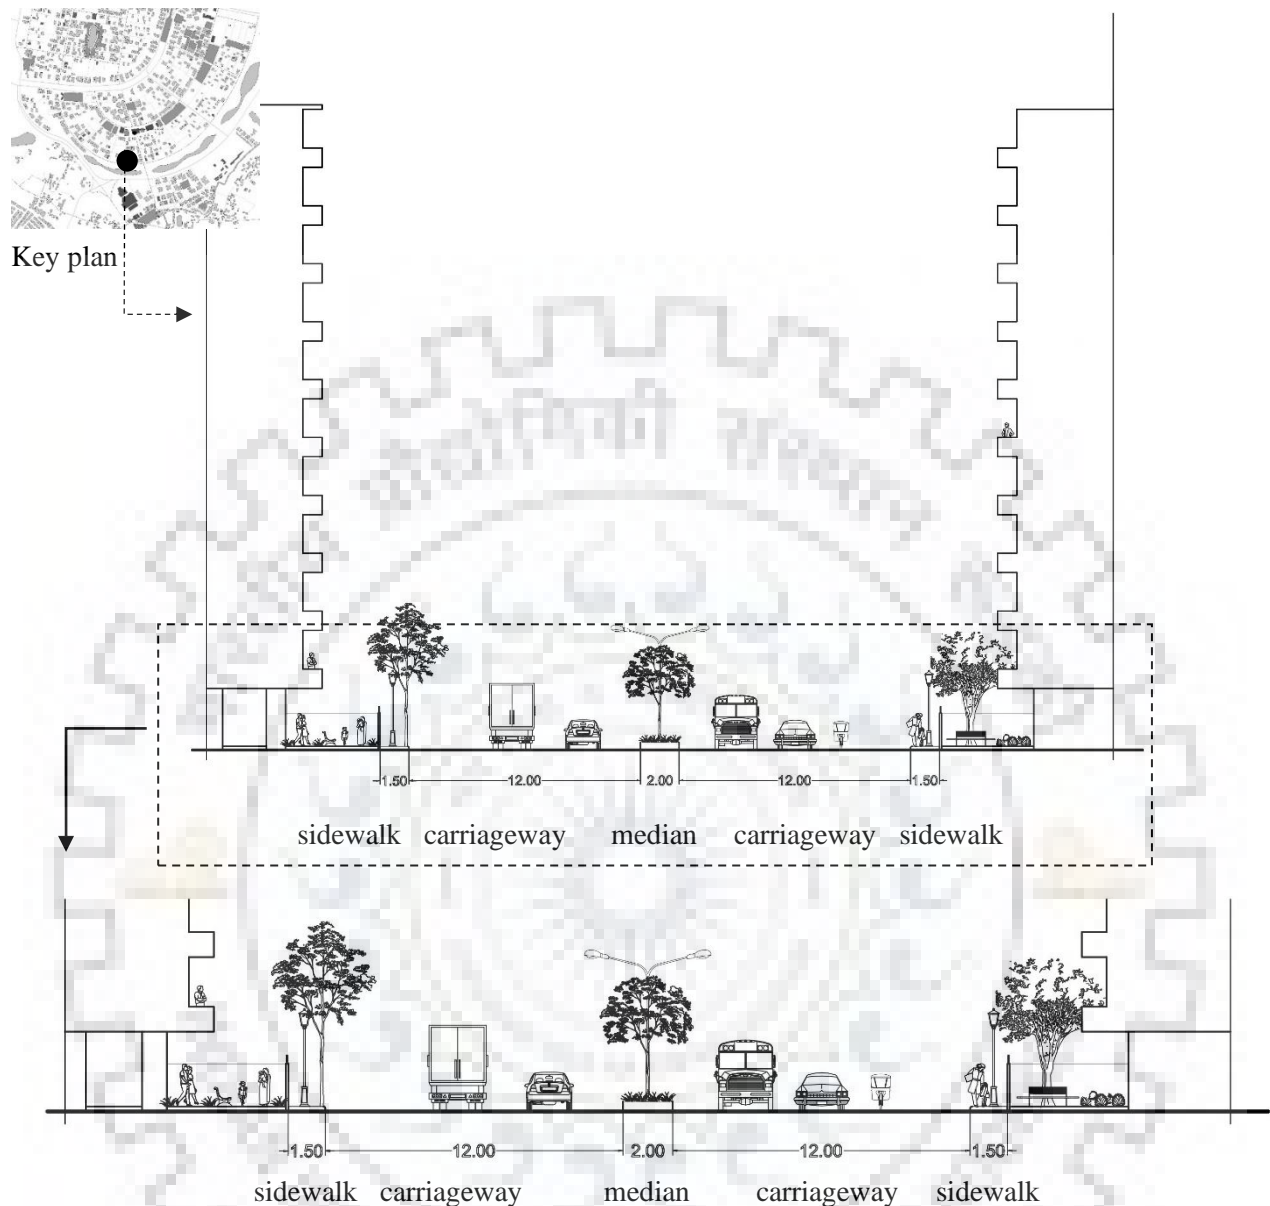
Street section of street number 0306, Action Area I, New Town
